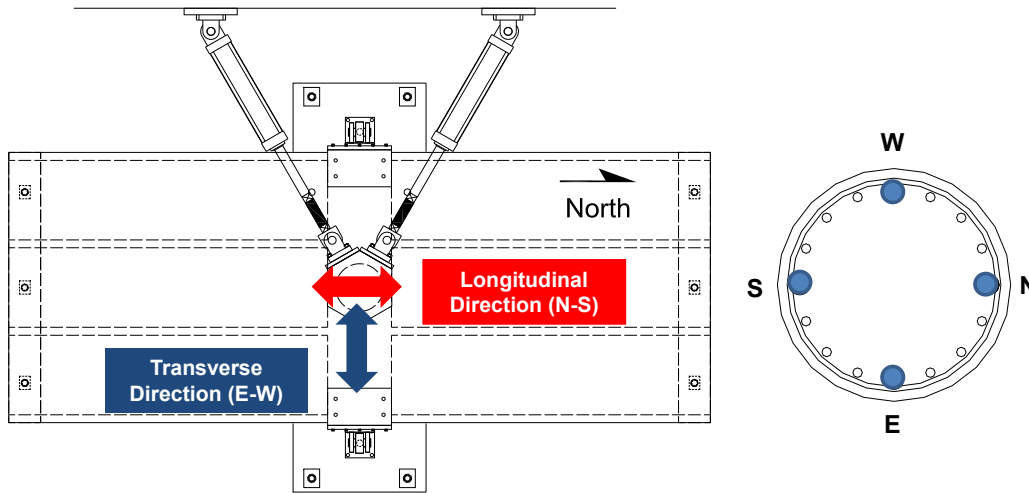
layout of the instrumented column rebars in SP2 as related to the loading directions
